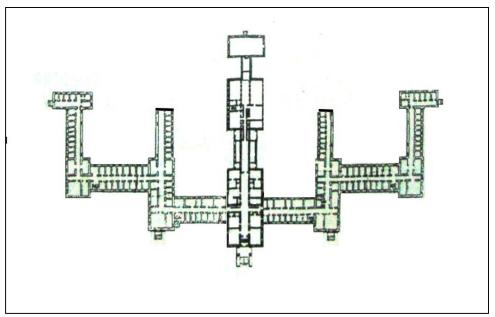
Reconstructed image of the final plan (Design by the author)
